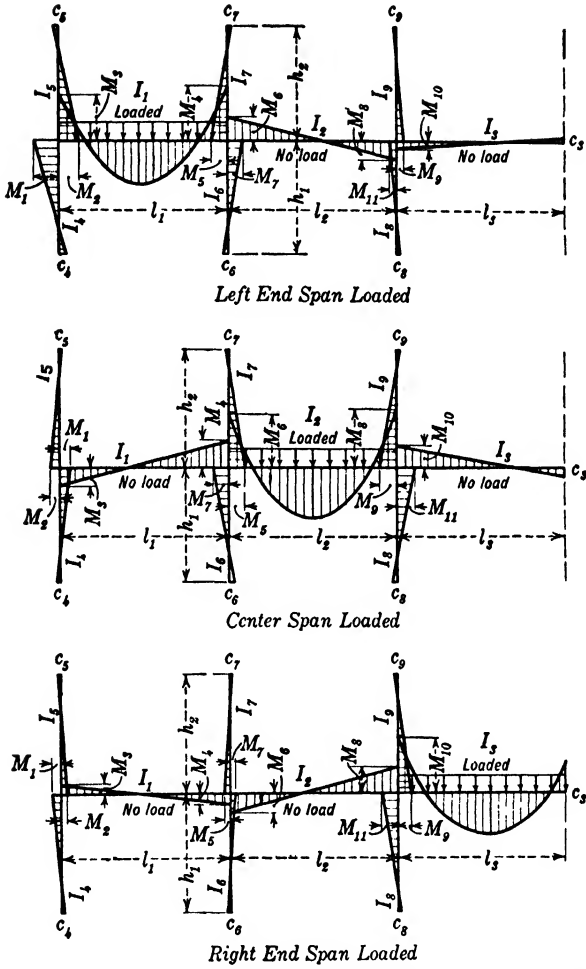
Substitute Frame for Wall Columns. (See p. 390.)
